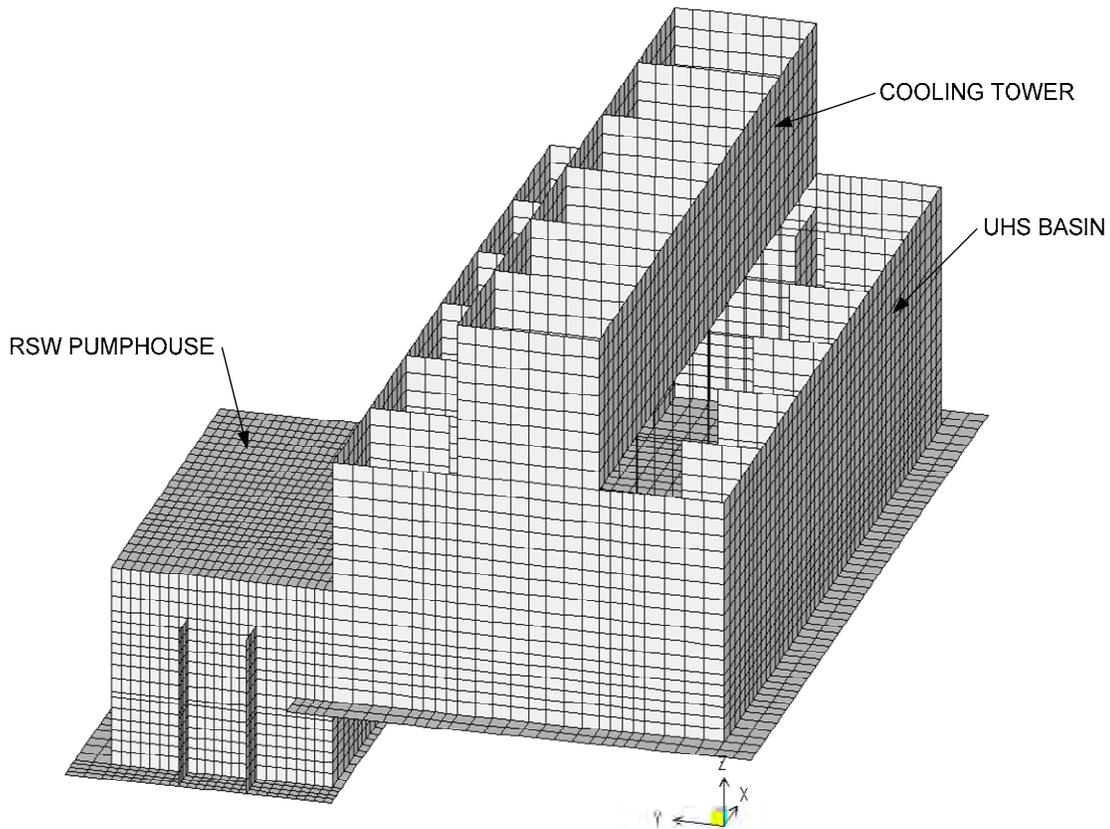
H.6-40: SAP Finite Element Model for UHS and RSW Pump House Design
